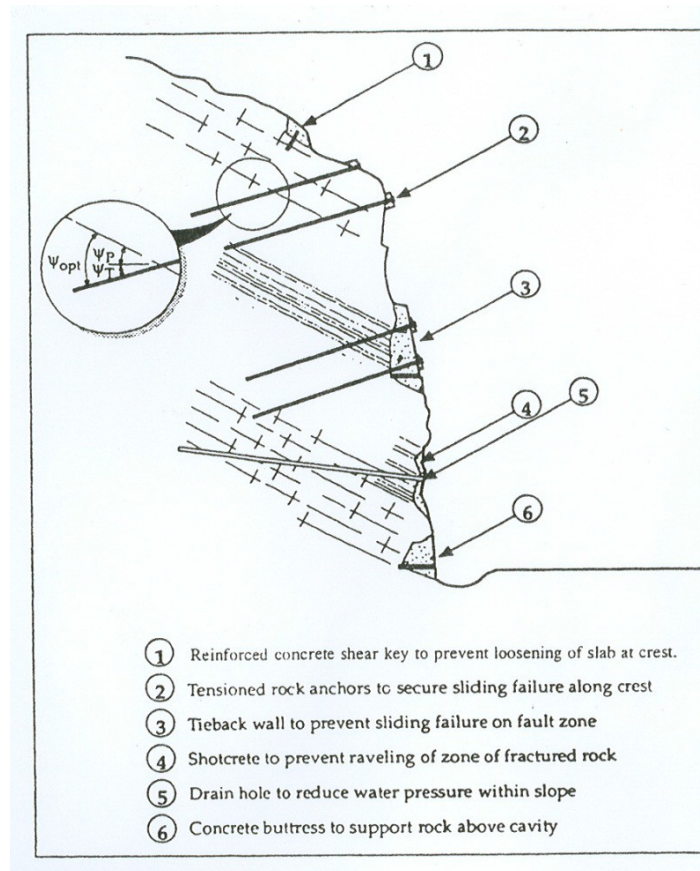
Rock Slope Reinforcement Methods (Landslide Investigation and Mitigation, TRB Special Report 247, 1996).
